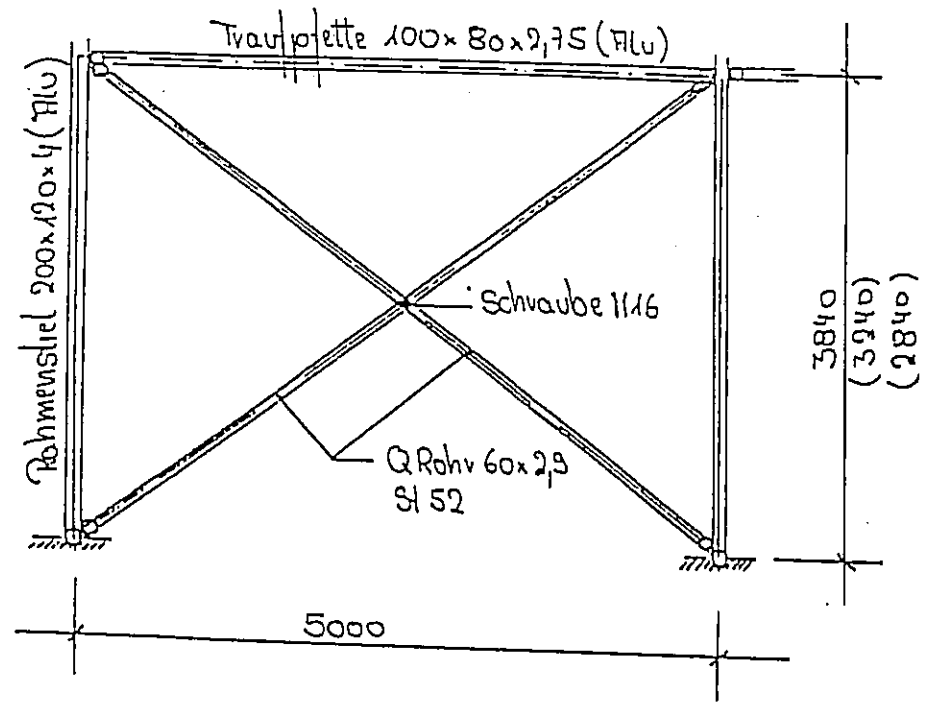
Section Assignment, 20 m H 3.24 (Side Wall)
